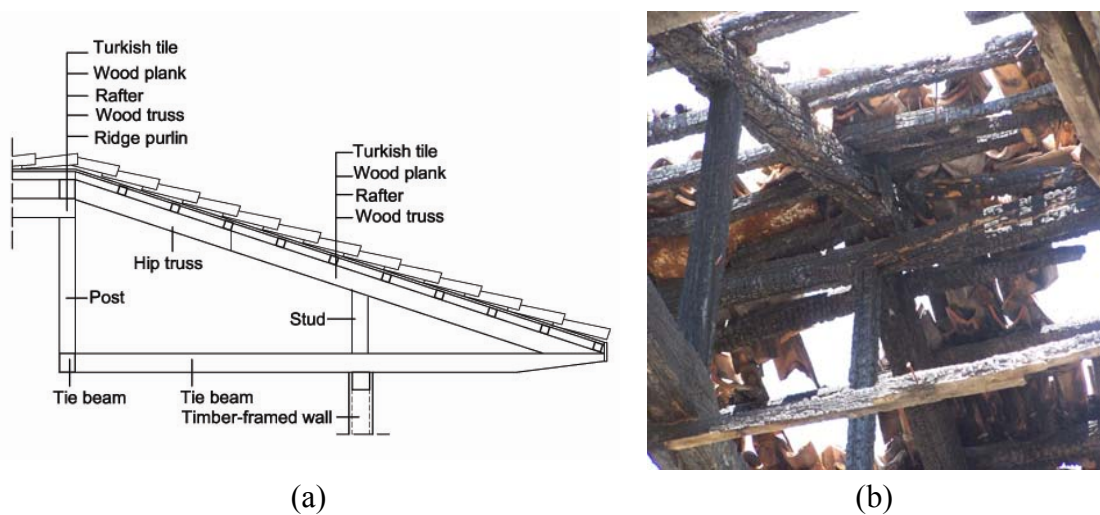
a. Detail from sloping surface in short side of hipped roof (Şeyh Cami St. No: 32) b. Connection details of roof elements (Cami St. No: 12) [b].
